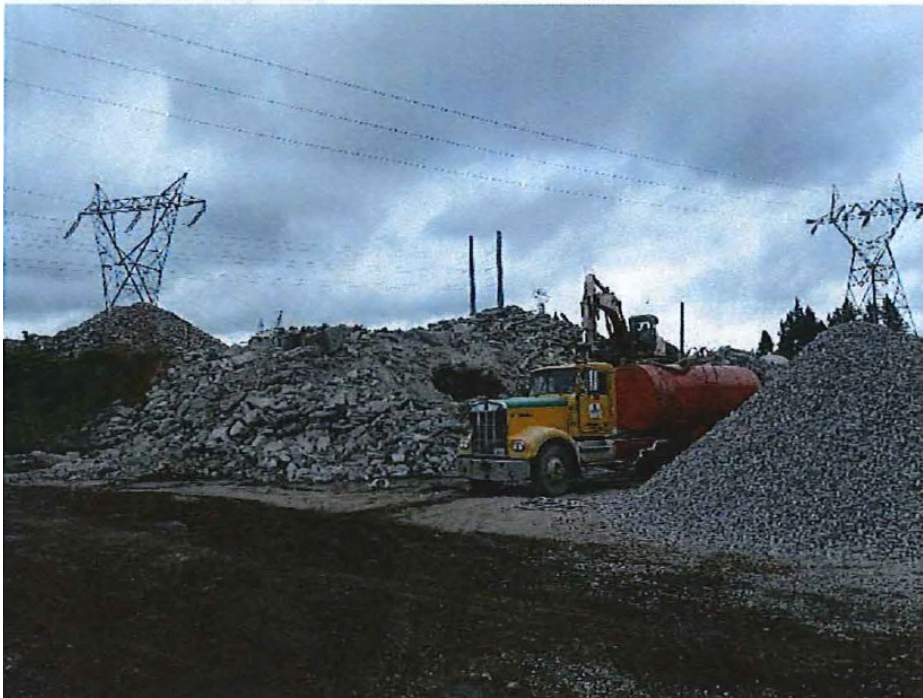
Recycled concrete stockpiles at a permitted¹ facility in Washington State.
